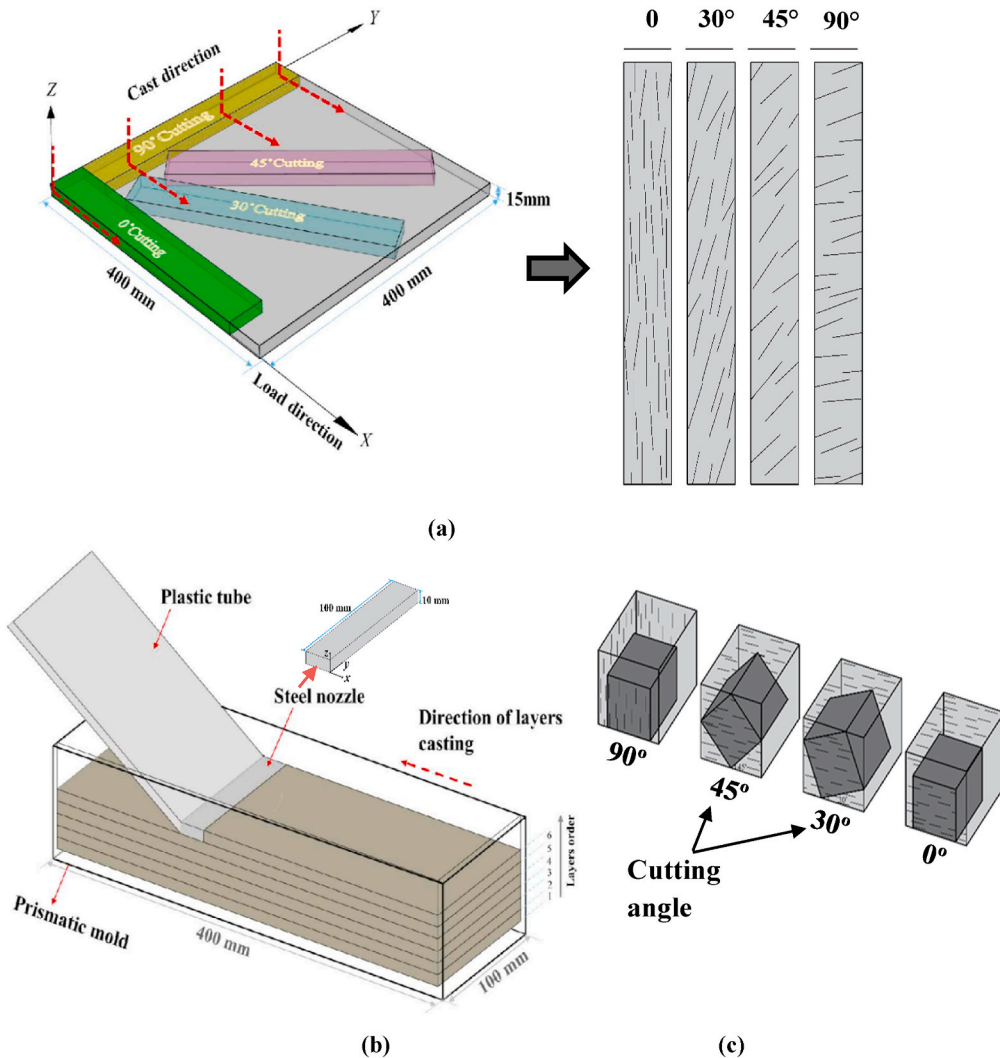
Schematic description of casting and cutting directions of ECC specimens a) Slab specimen b) Prismatic specimen c) Different cutting angle.
